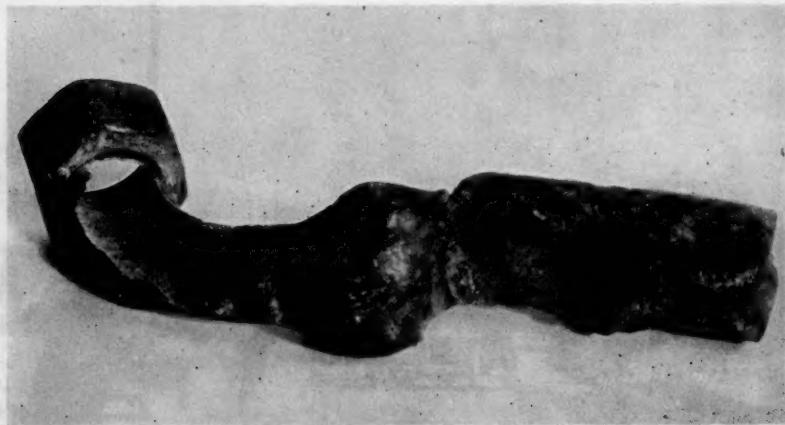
MACKINAW AVE., 62 FEET SOUTH OF 89TH ST. DEFECTIVE WIRED JOINT AND COUPLING
